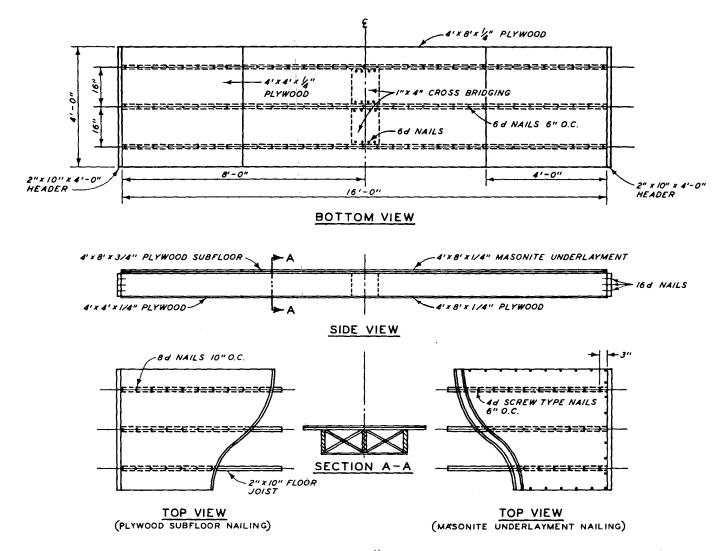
Construction drawing for the 1/4-inch plywood reinforced test specimens (III and IV).
